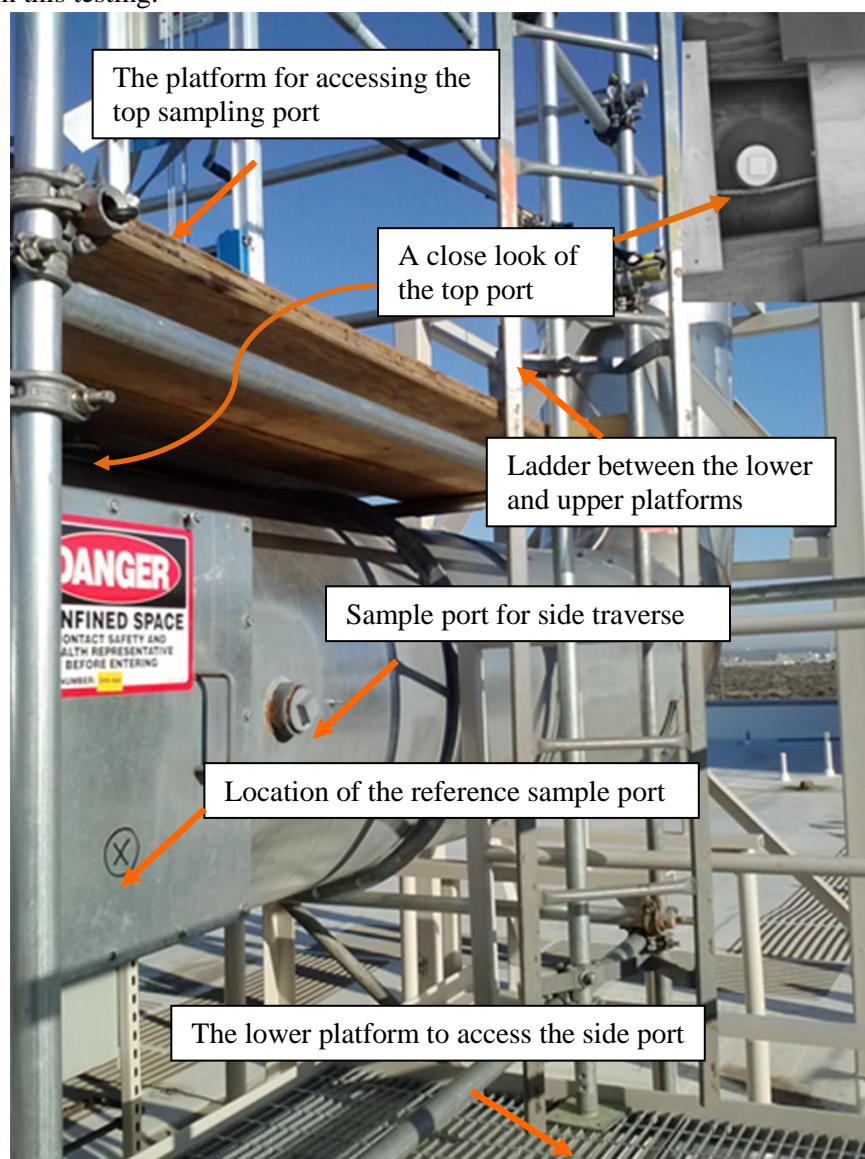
Layout of Testing Platforms for the 3410 Stack Testing.
